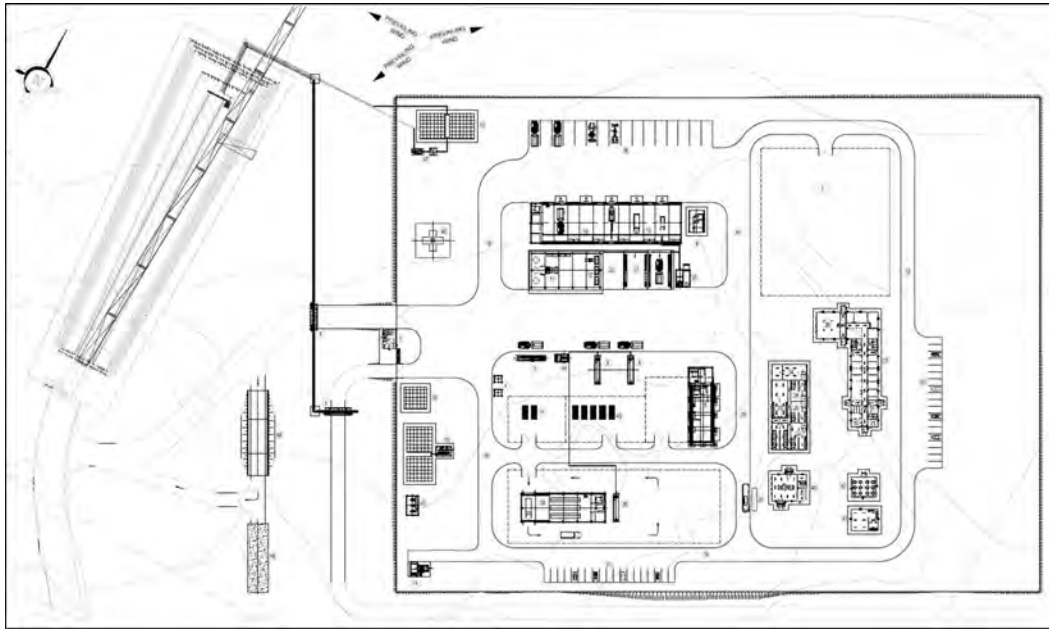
Proposed Layout of Surface Mining Infrastructure.
